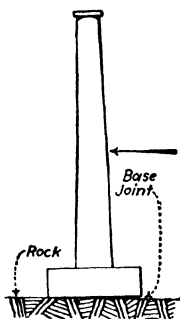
Entire structure tilting under wind pressure—unyielding soil beneath foundation.
